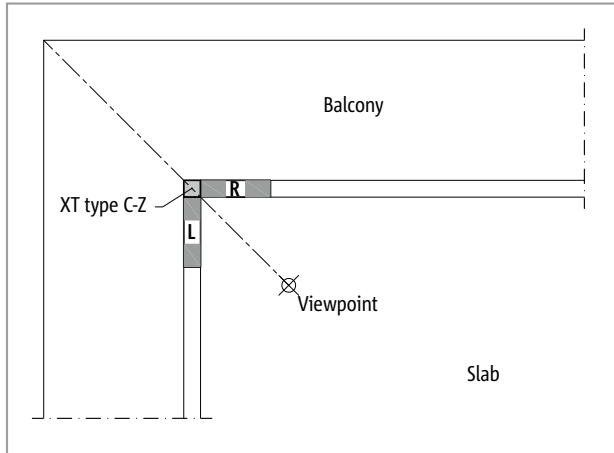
Schöck Isokorb® XT type C: Arrangement XT type C-L left from viewpoint, arrangement XT type C-R right from viewpoint
